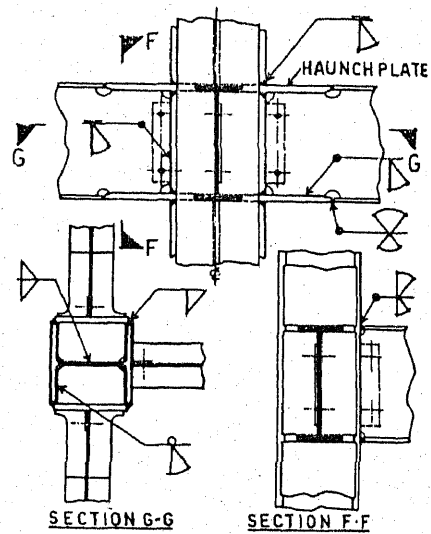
EXTERIOR BEAM TO COLUMN JOINT.
